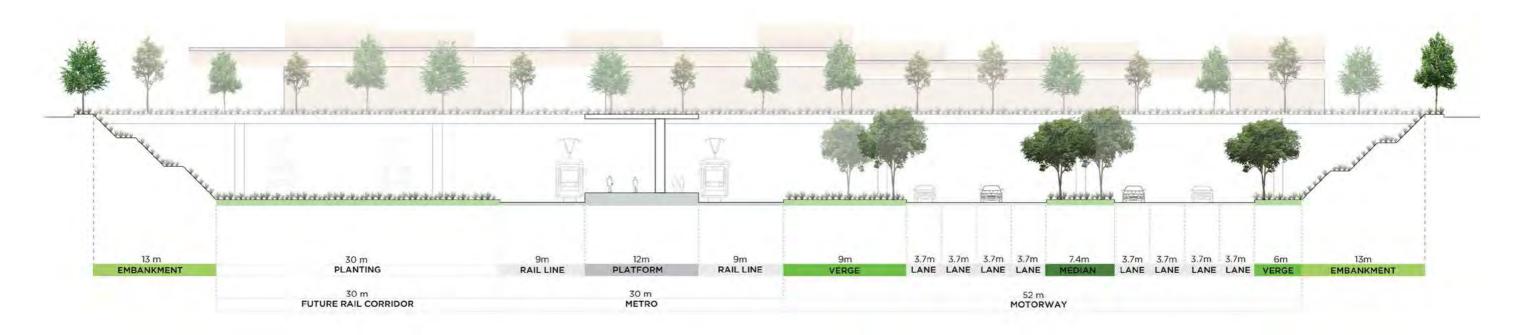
Indicative Metro Corridor and Main Access Road Section Plan
